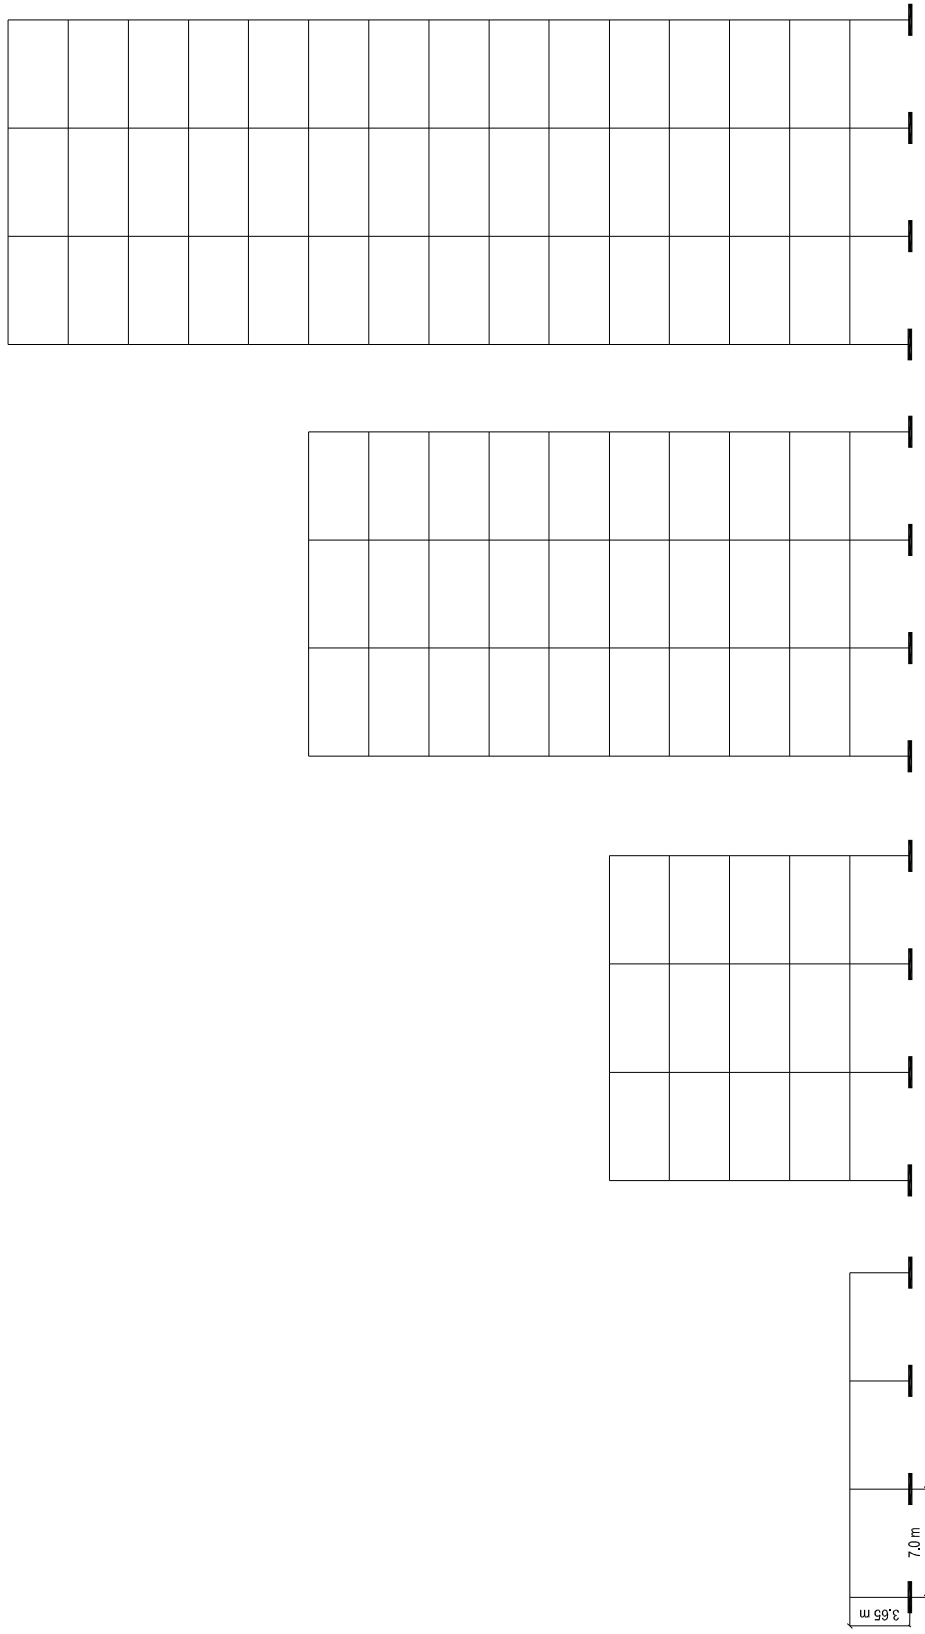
Side view (transverse direction) of 1, 5, 10 and 15 storey buildings with typical floor height of 3.65 m and varying span length (3.5, 5, 7 and 9 m) horizontally.
